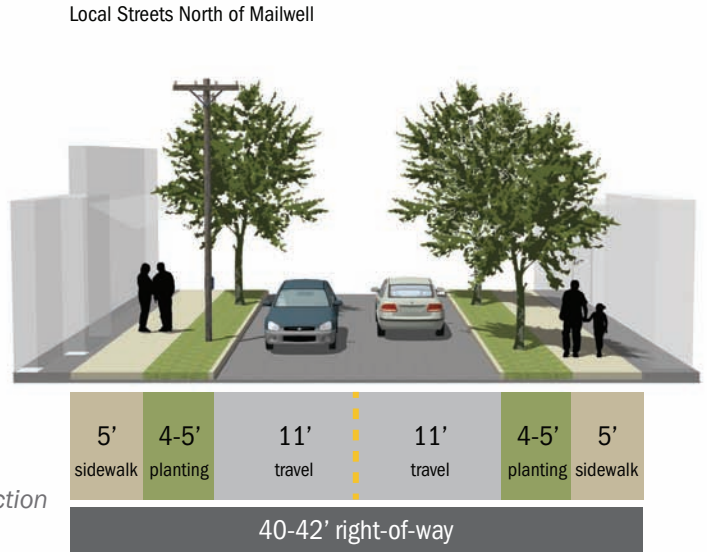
Proposed Conceptual Cross-Section for Local Streets with a 40' right of way
